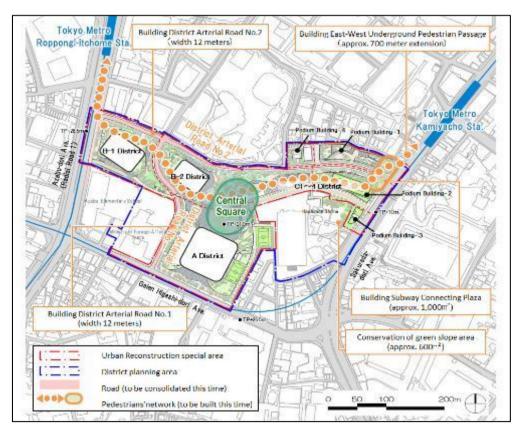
Site Plan of Toranomon-Azabudai Project (www.mori.co.jp)
